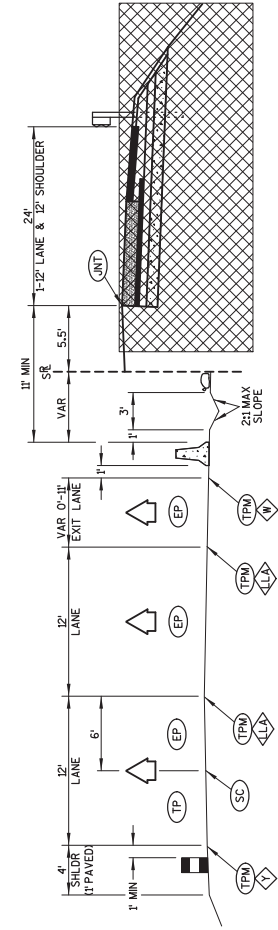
DETAIL FOR PAVING BEHIND CONCRETE BARRIER TEMPORARY PRECAST
